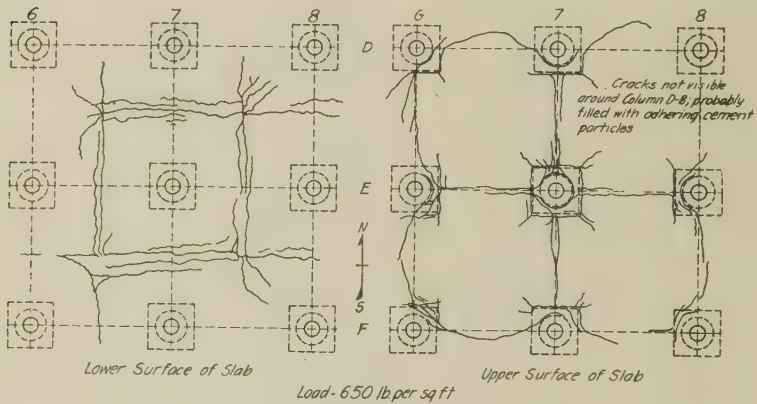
CRACKS ON UPPER AND LOWER SURFACES OF SLAB.
